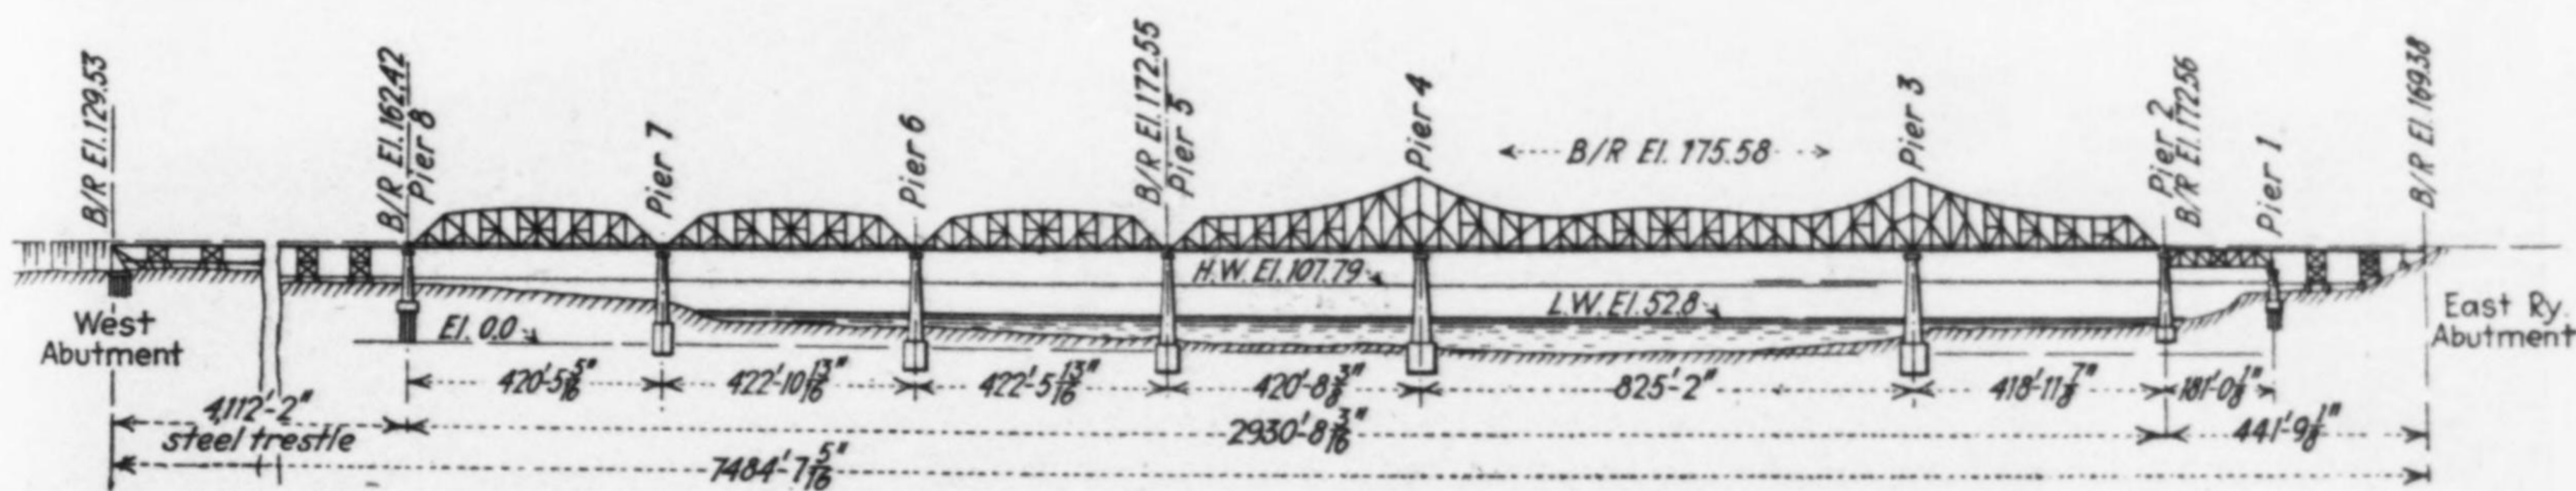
GENERAL ELEVATION OF THE MISSISSIPPI RIVER BRIDGE AT VICKSBURG, MISS.
